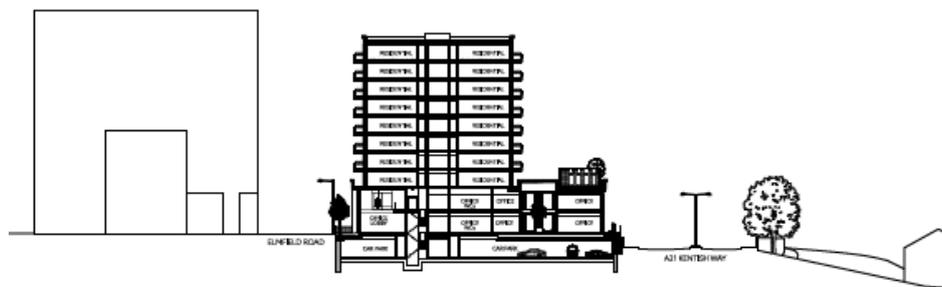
Section drawing – across Elmfield Road and Kentish Way.
